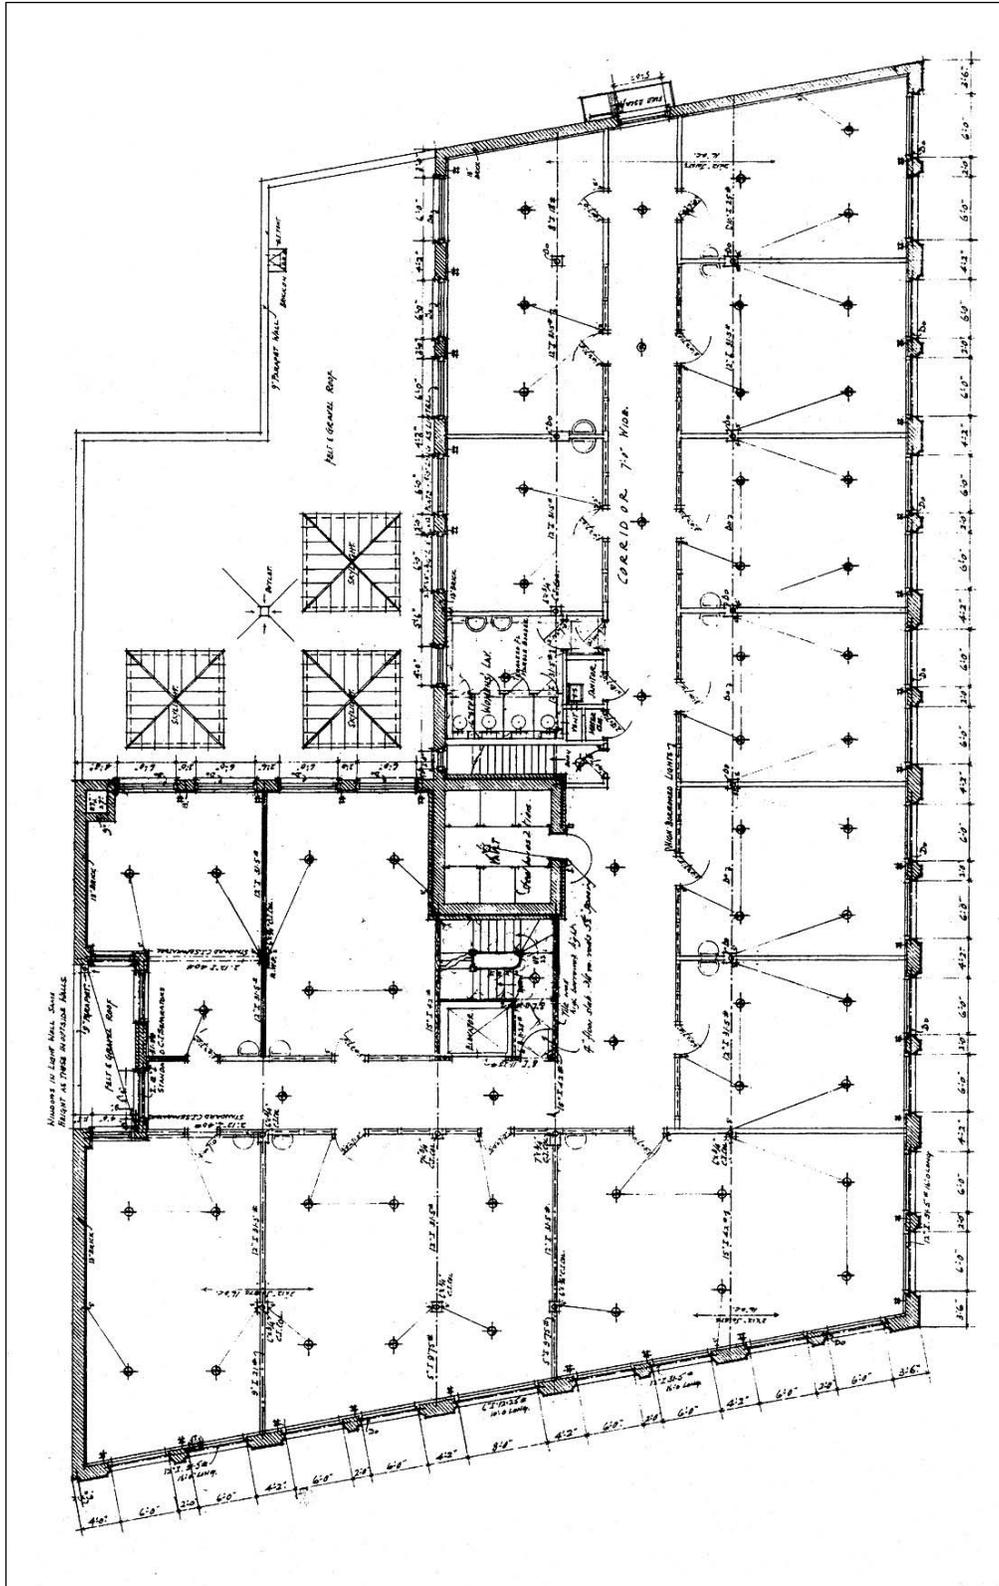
Architect’s plans, “Second Floor Plan,” 1912. (Courtesy of City Archives, Plan #1399/1912.)
